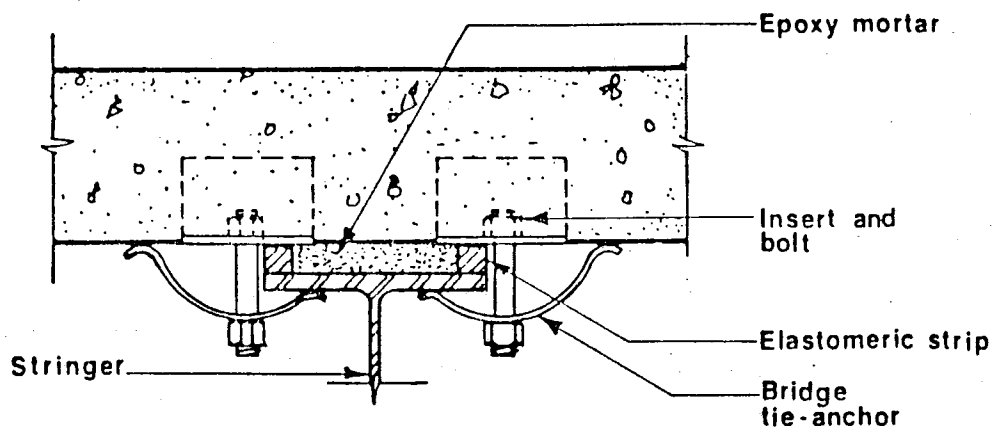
Connection Detail, Clark's Summit Bridge (9).
